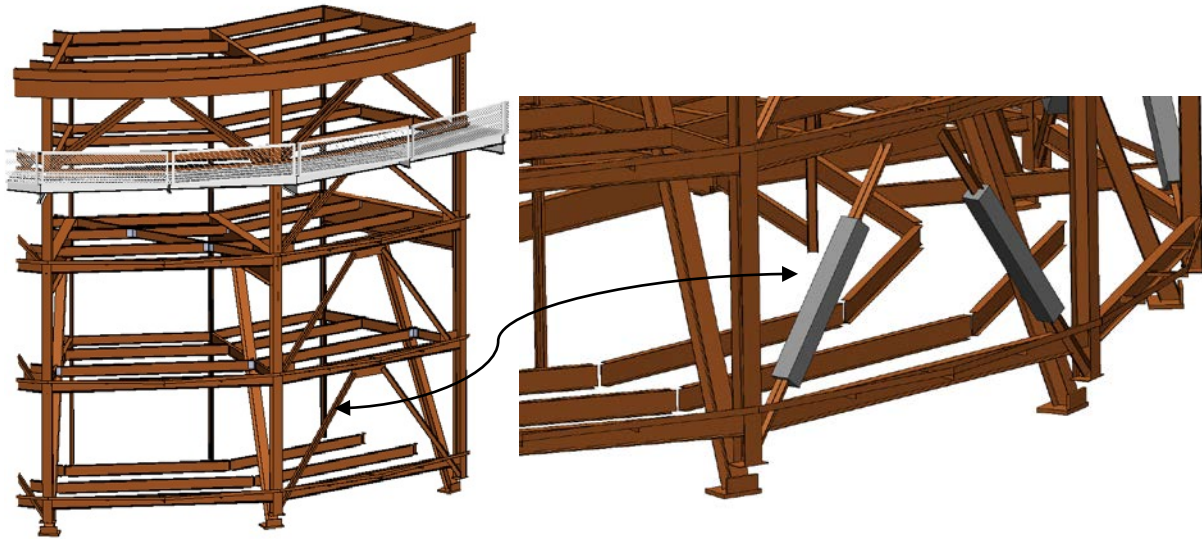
Model of the steel building structure and the modification of replacing a lateral beam with a BRB member
